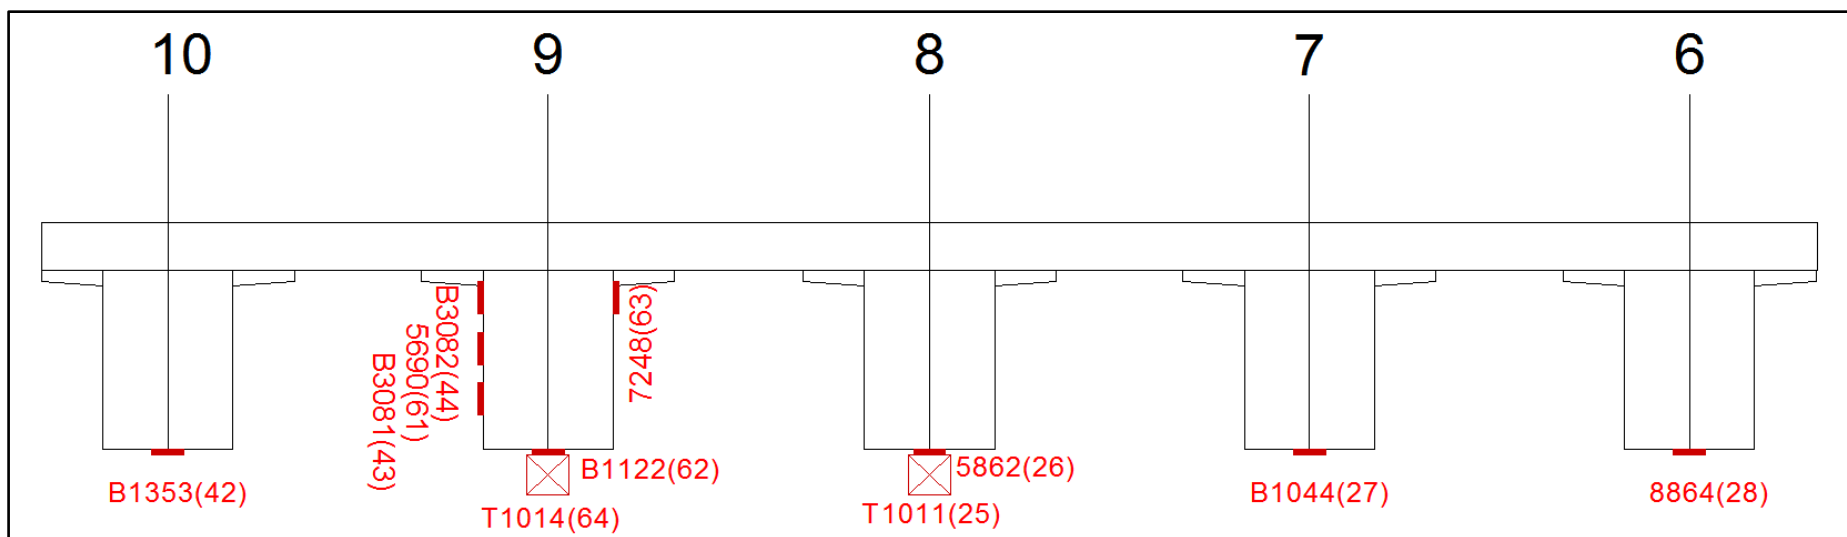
Round 1 Tests - Section A-A instrumentation plan showing sensor IDs, Channel IDs, & sensor locations.
